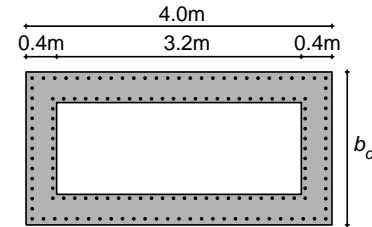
The hollow rectangular section for the pier column: 4m wide in the transverse direction,  $b_c$  width in the longitudinal direction and an all around concrete thickness of 0.40m.
